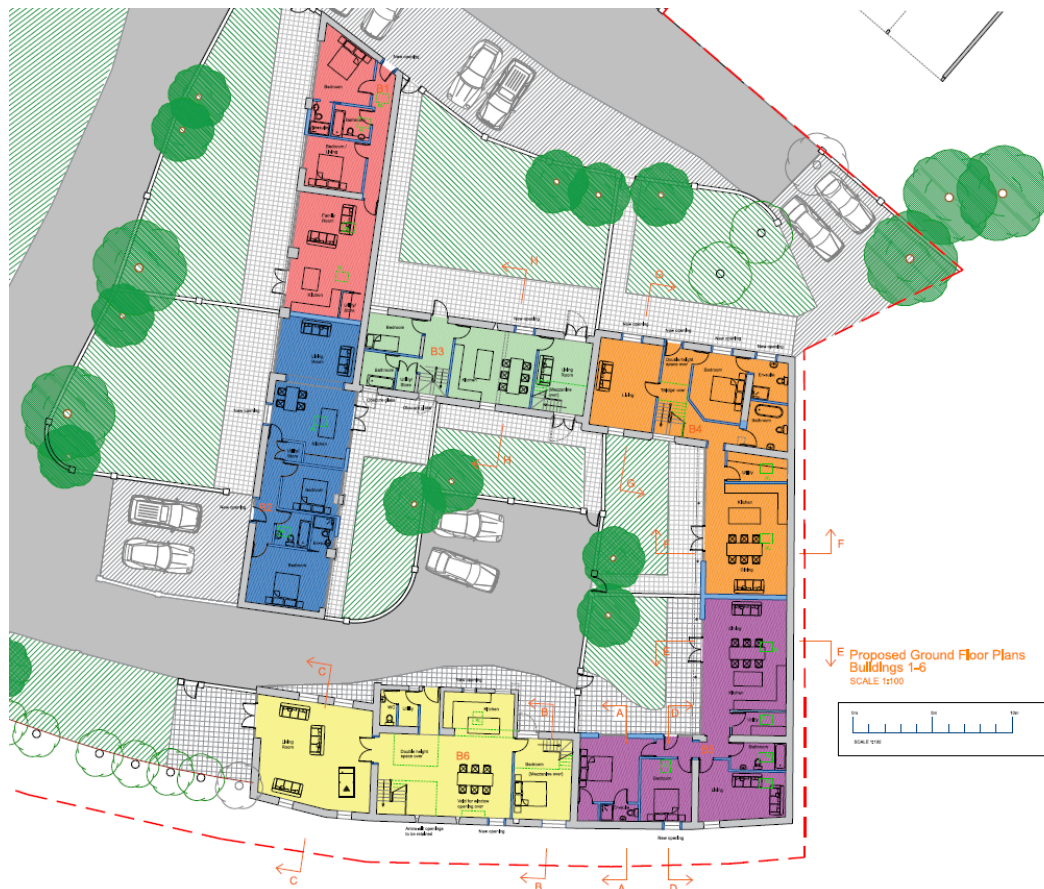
ground floor plans for the conversion and rebuilding for the main yard to 6 dwellings
